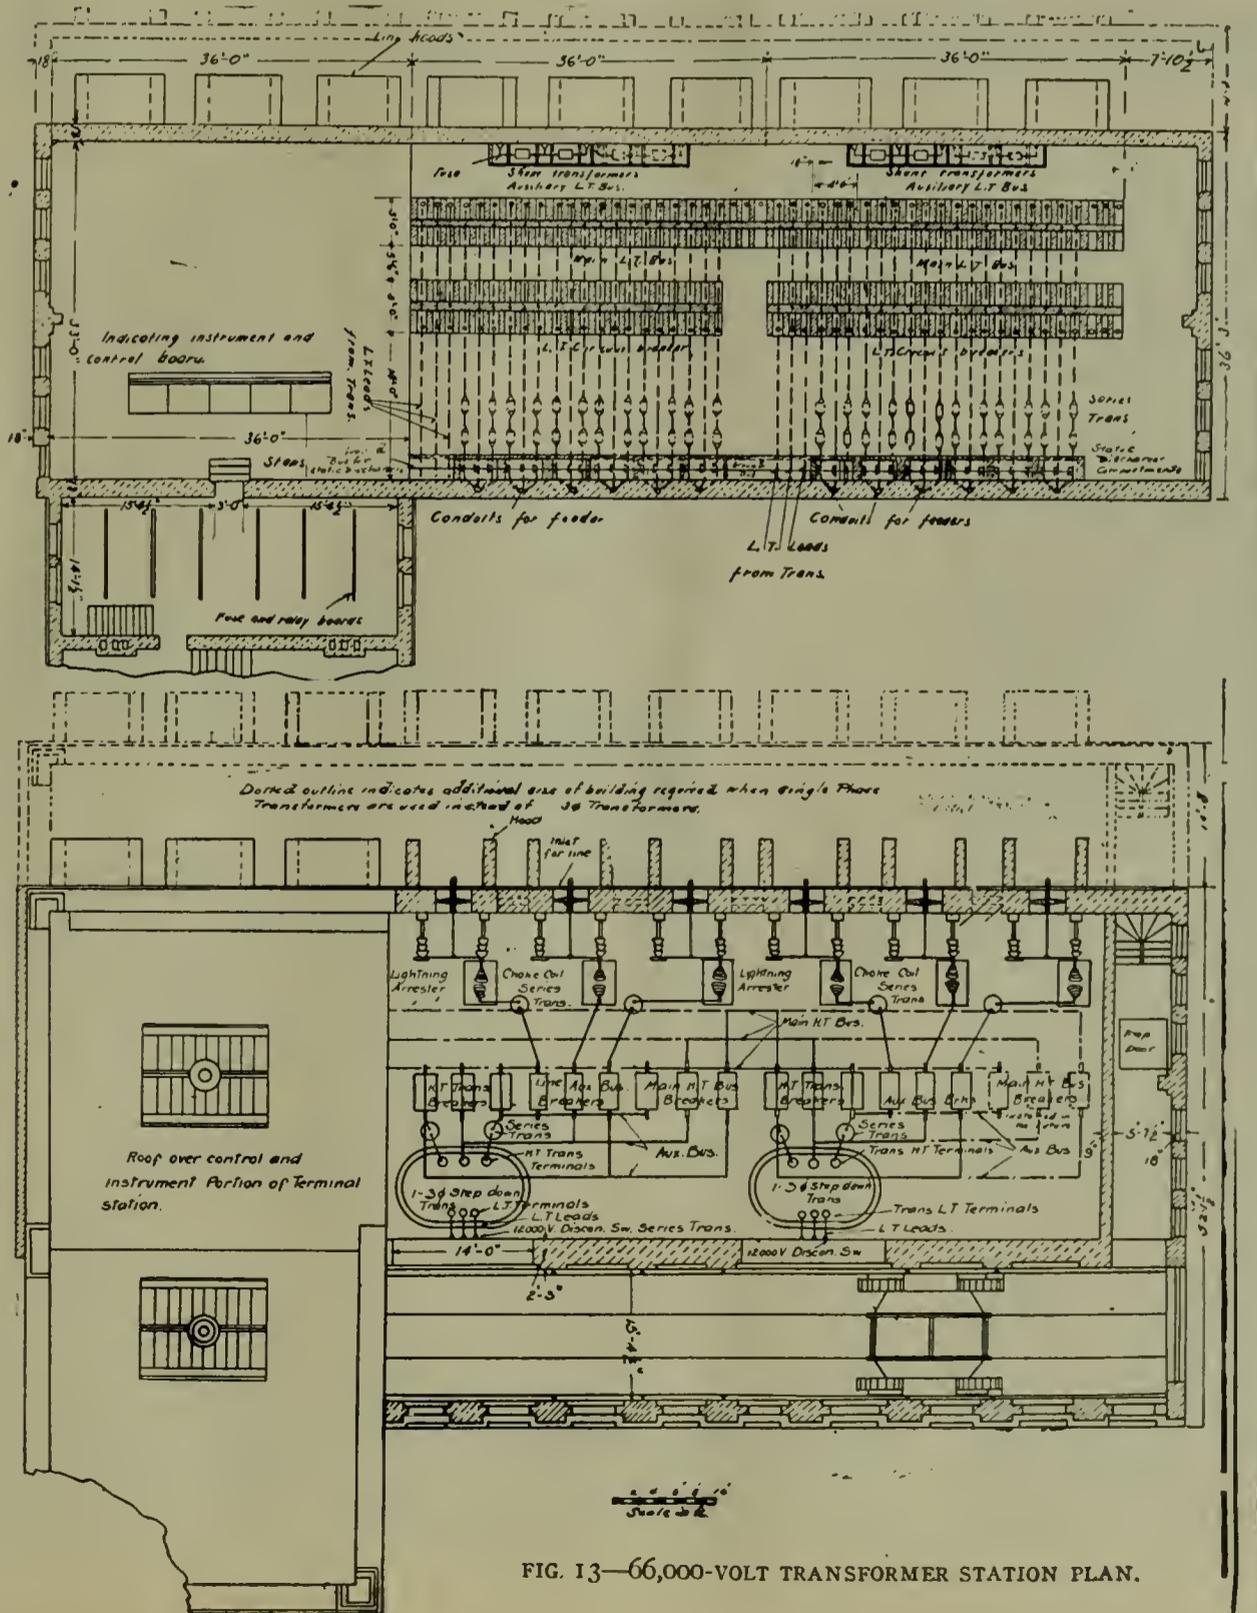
66,000-VOLT TRANSFORMER STATION PLAN.
